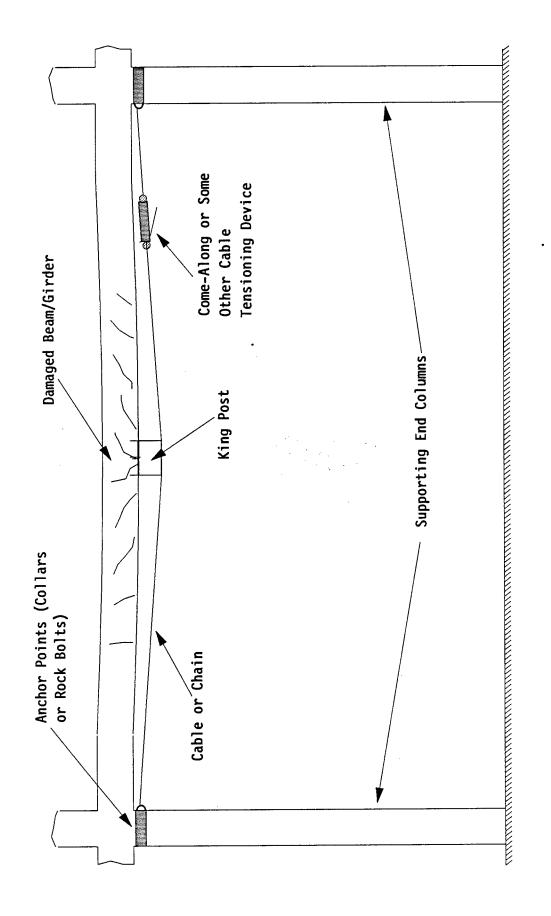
Shoring Badly Damaged Reinforced Concrete Beam with a King Post.
